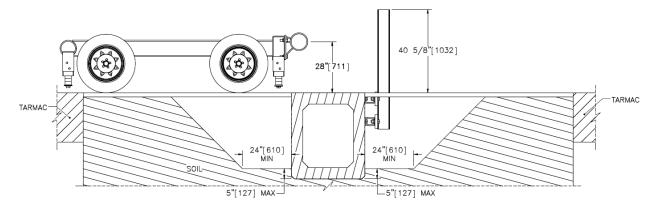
Bogie Testing Setup - End View of Box-Beam with Side-Mounted Post
